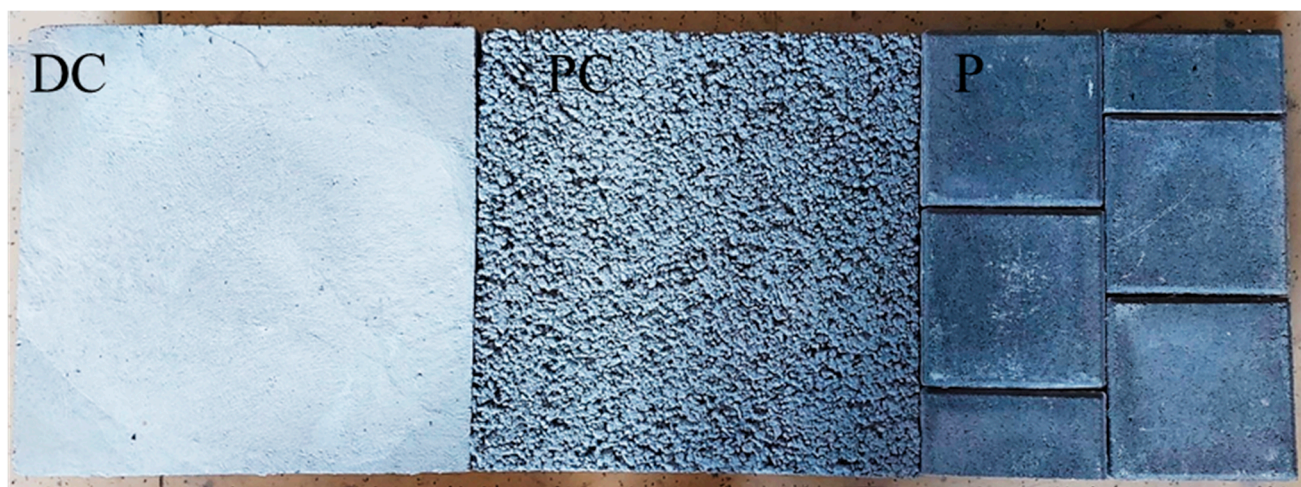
Concrete paving flags and pavers (DC, PC and P).
